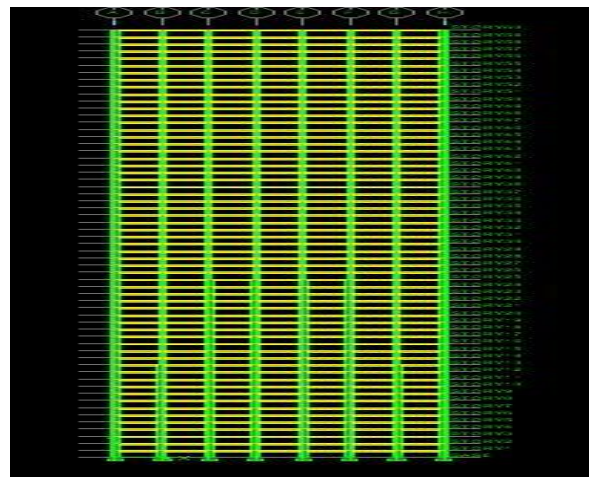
Elevation of multi O-H-V on 30-45-60 stories at section 1-1
